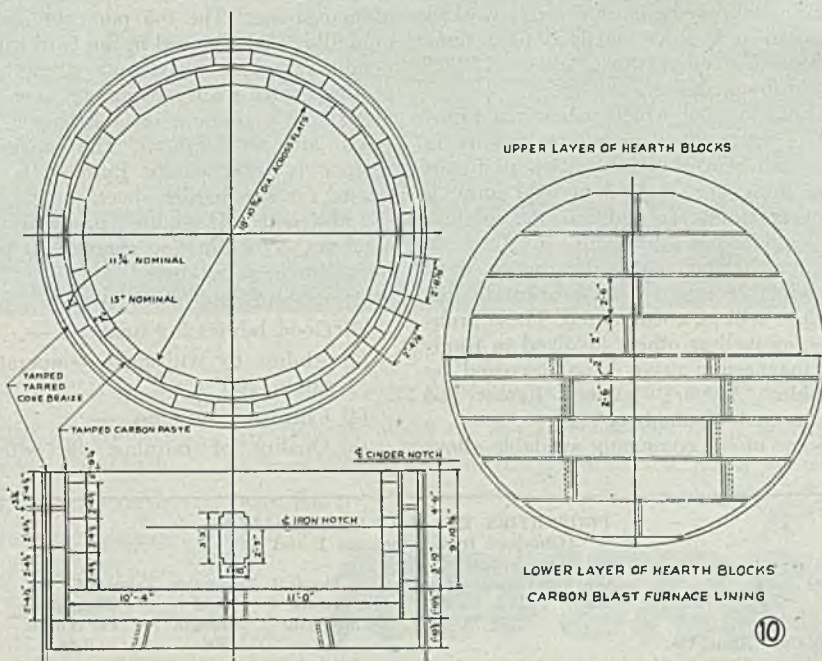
Details of hearth lining showing arrangement of staggering all joints in hearth and walls
